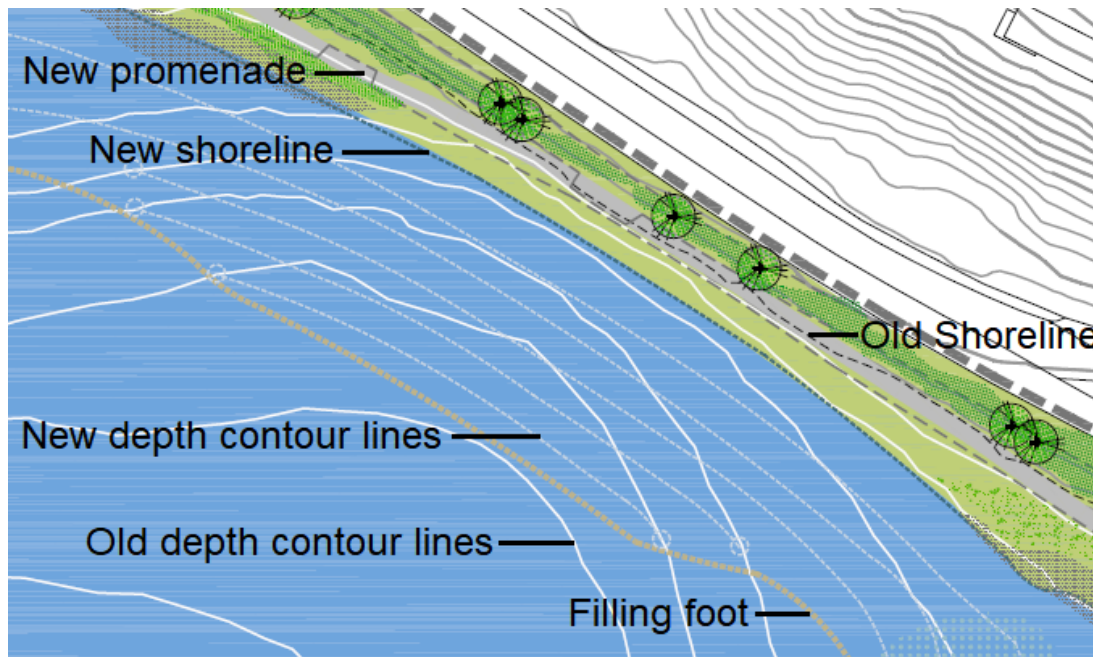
Excerpt from the sketch of the landscape plan showing the filling and the planned promenade in Storvatnet. Picture based on sketch of landscape plan made by Sigrid Rasmussen, Asplan Viak. The whole sketch is showed in appendix I.
